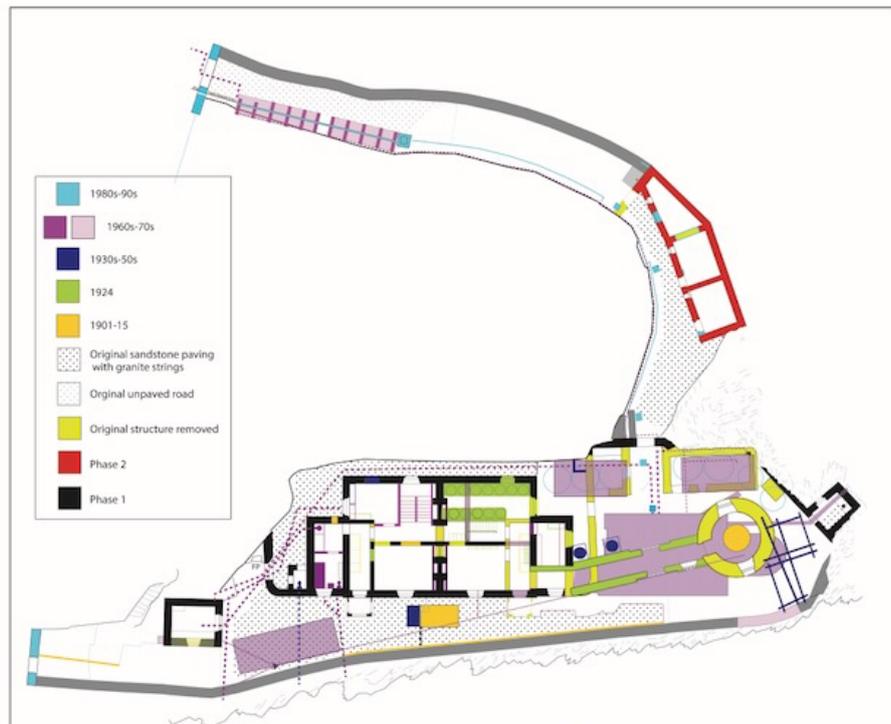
Phase plan of the Lower Lighthouse Station (A.R. Hayden).
